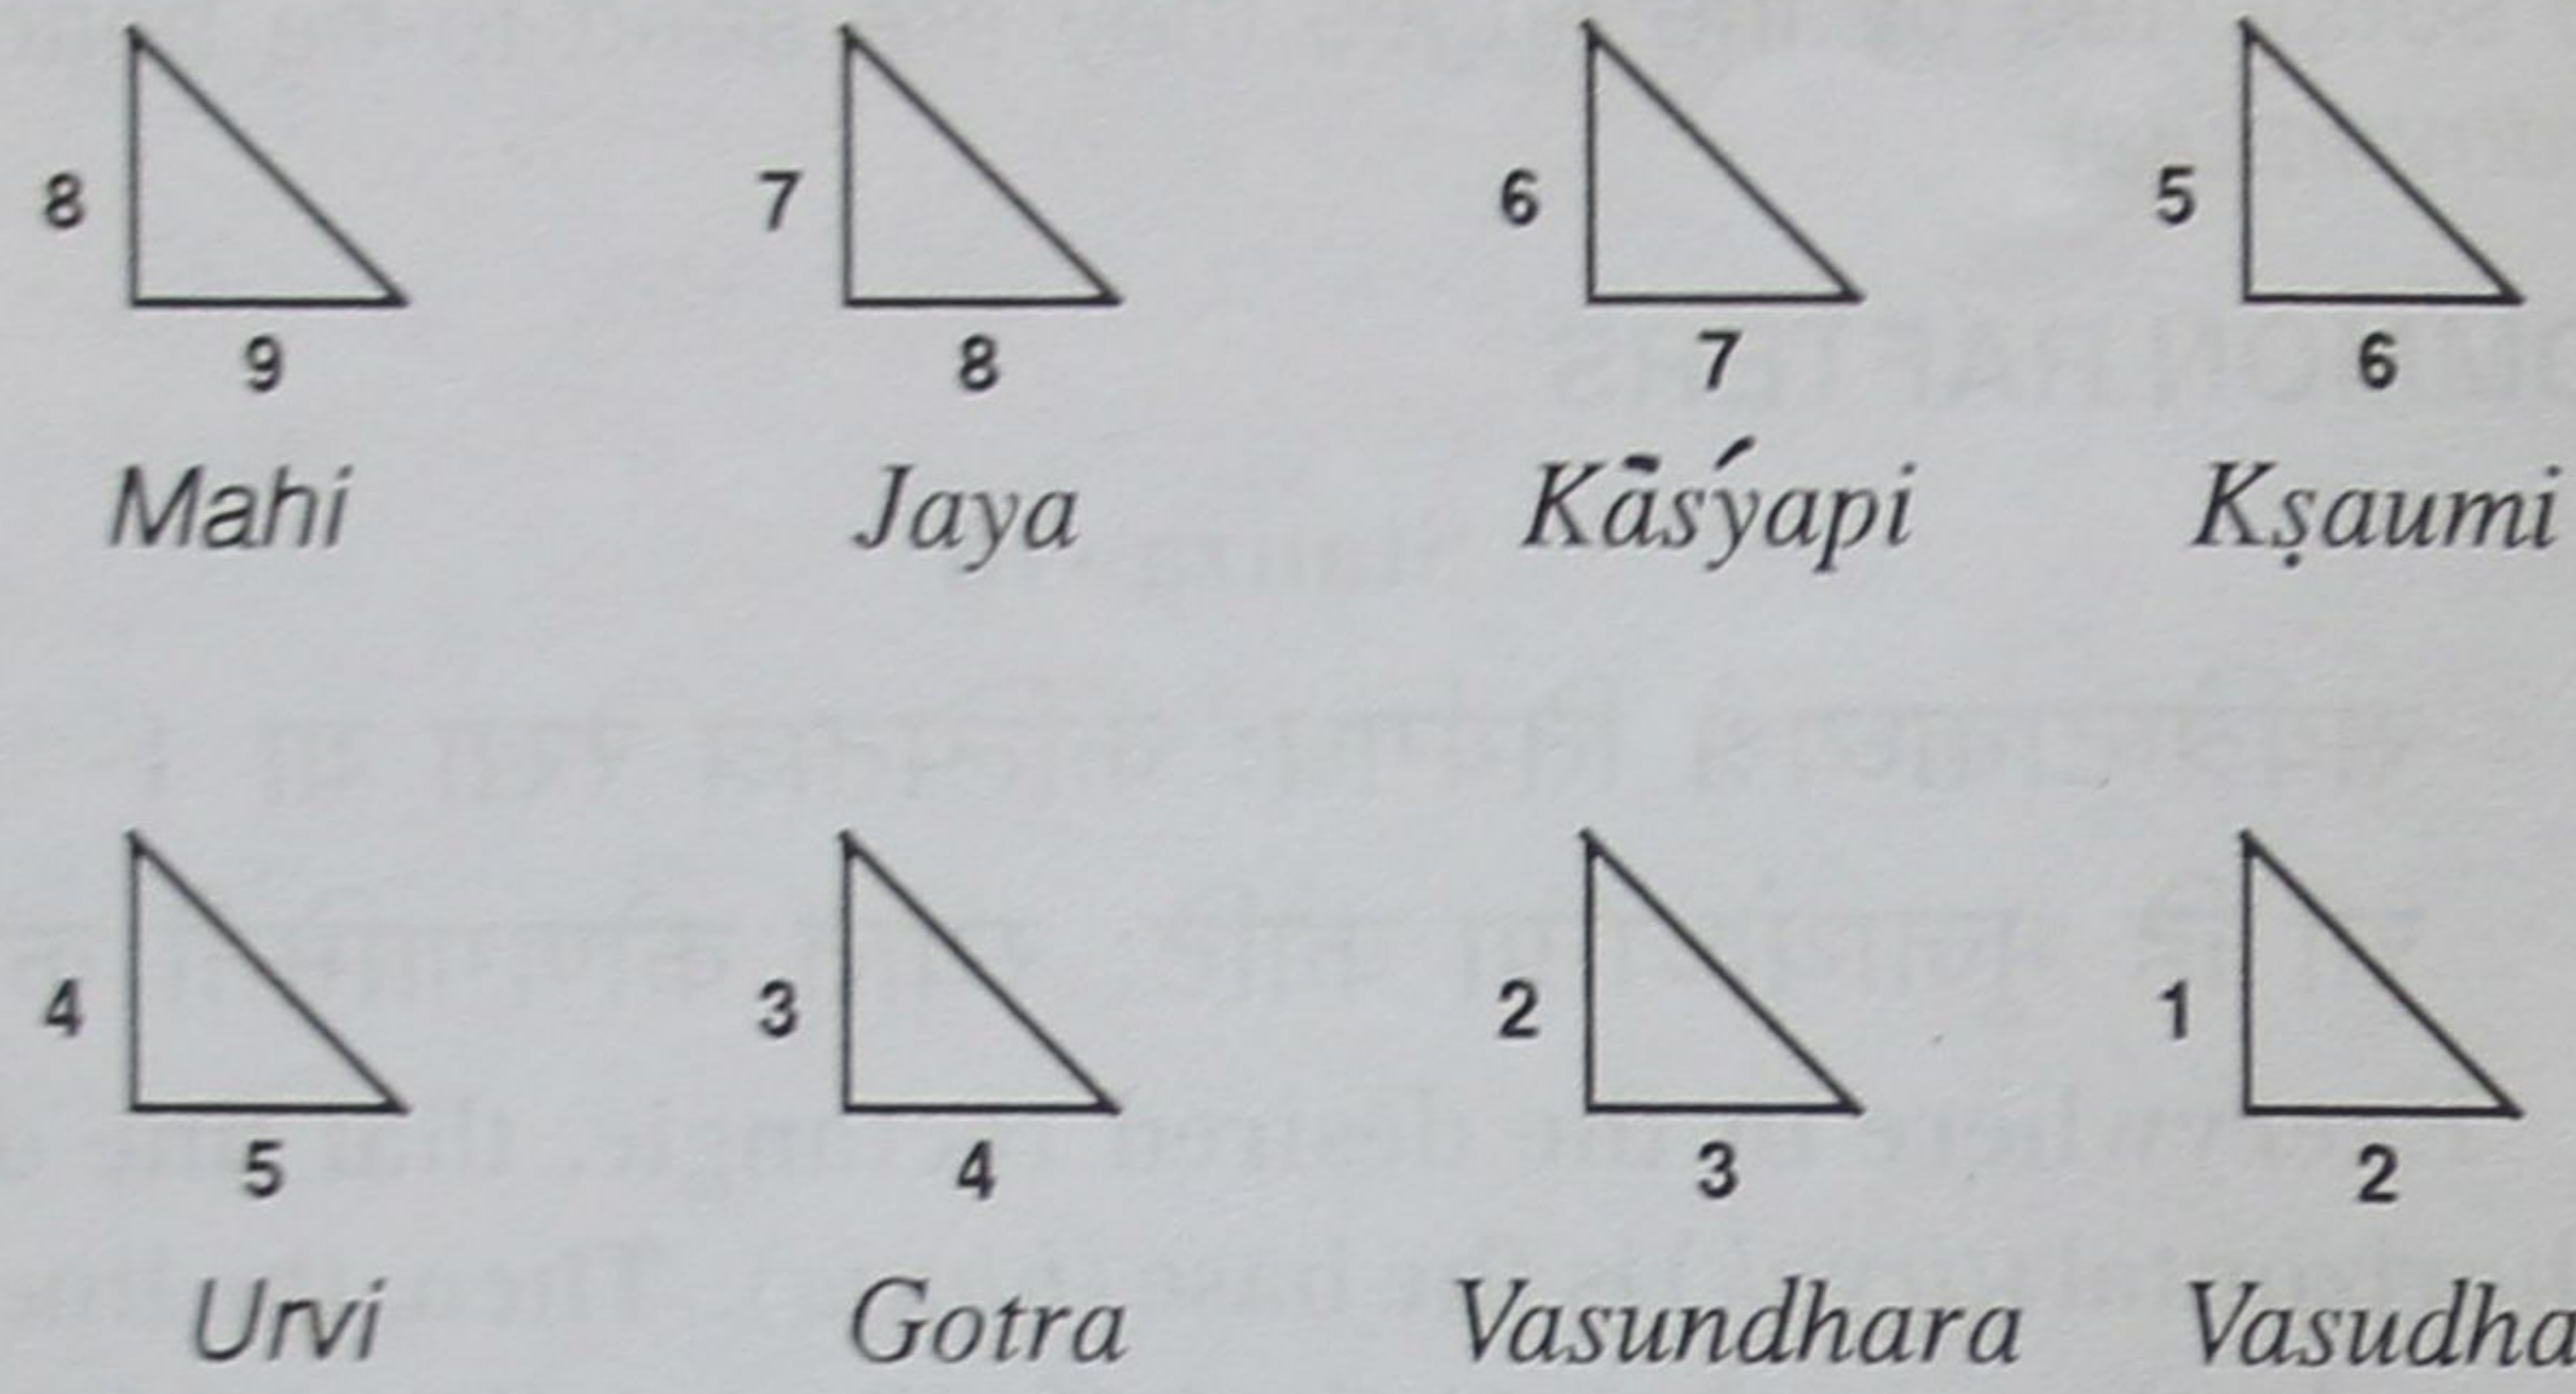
NAMES OF ROOF SLOPES FOR HOUSES
